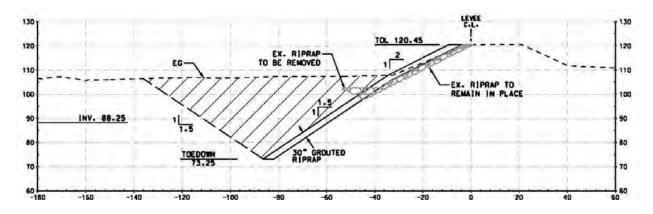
Typical Cross Section of Alternative F2 (Sta. 368+00)
